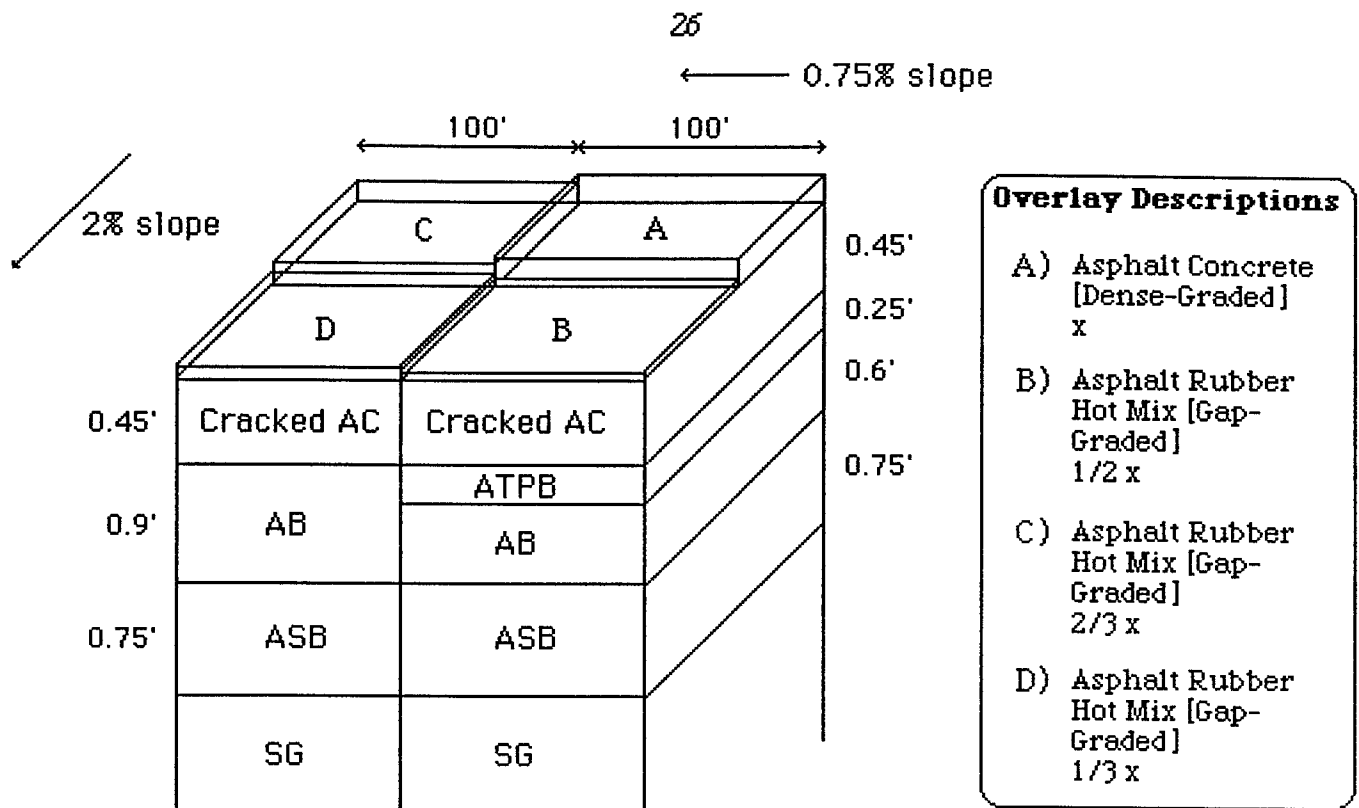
Construction of Overlays (Alternatives 1 & 2)
